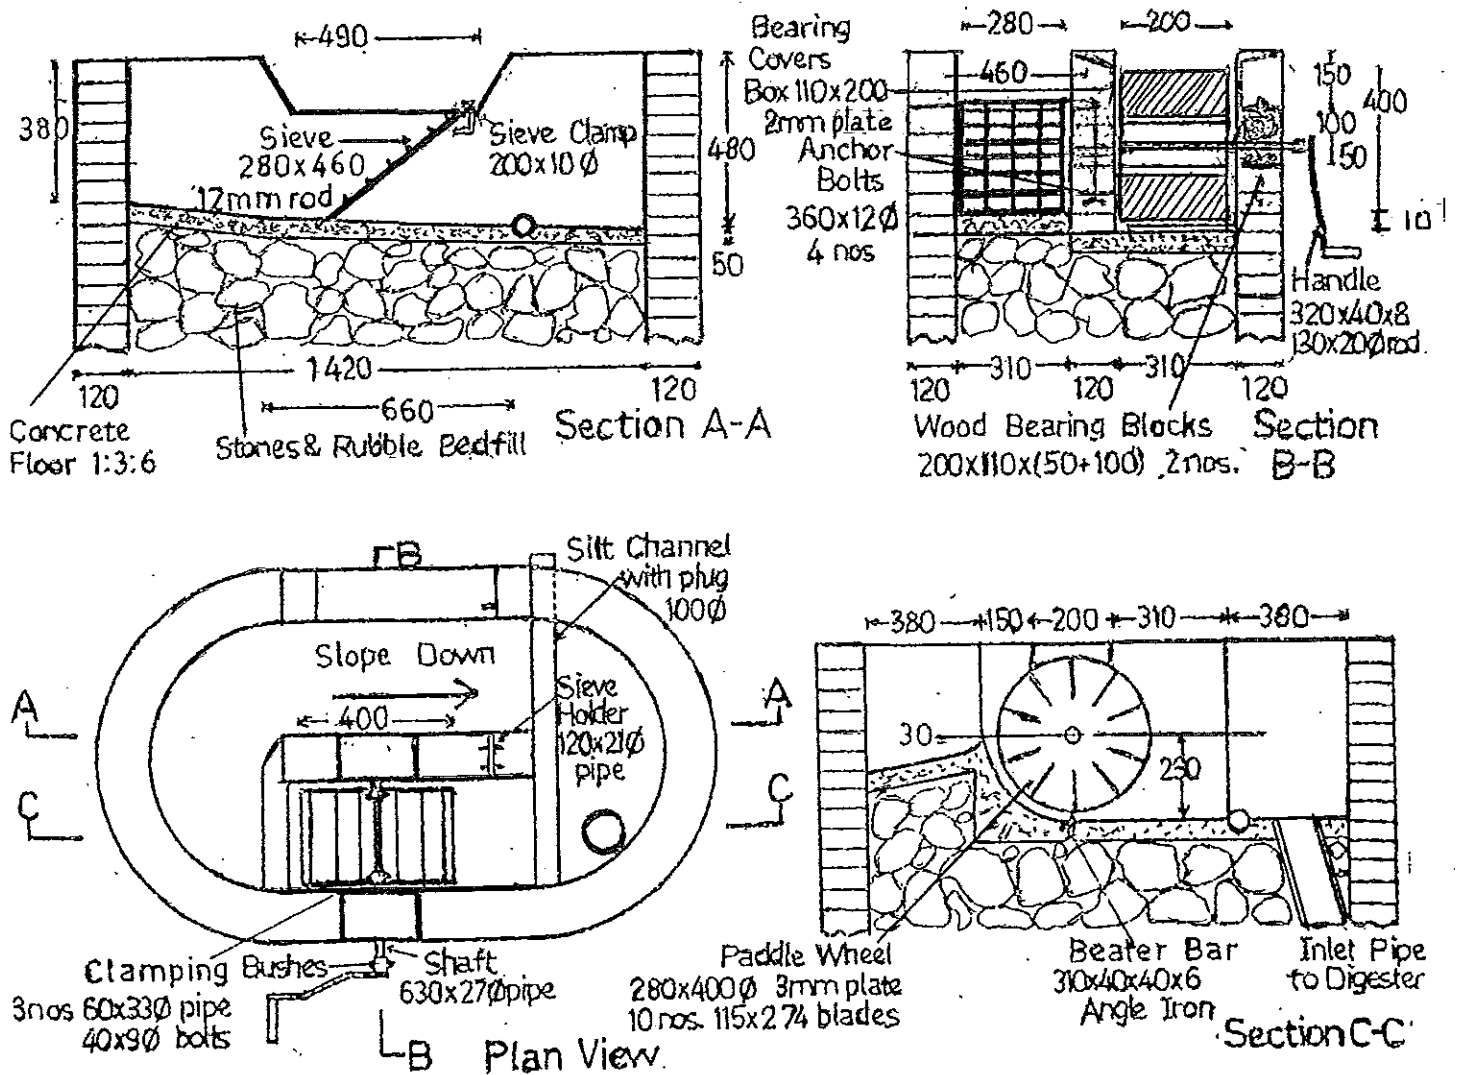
Detailed Drawings of Slurry Mixing Machine
